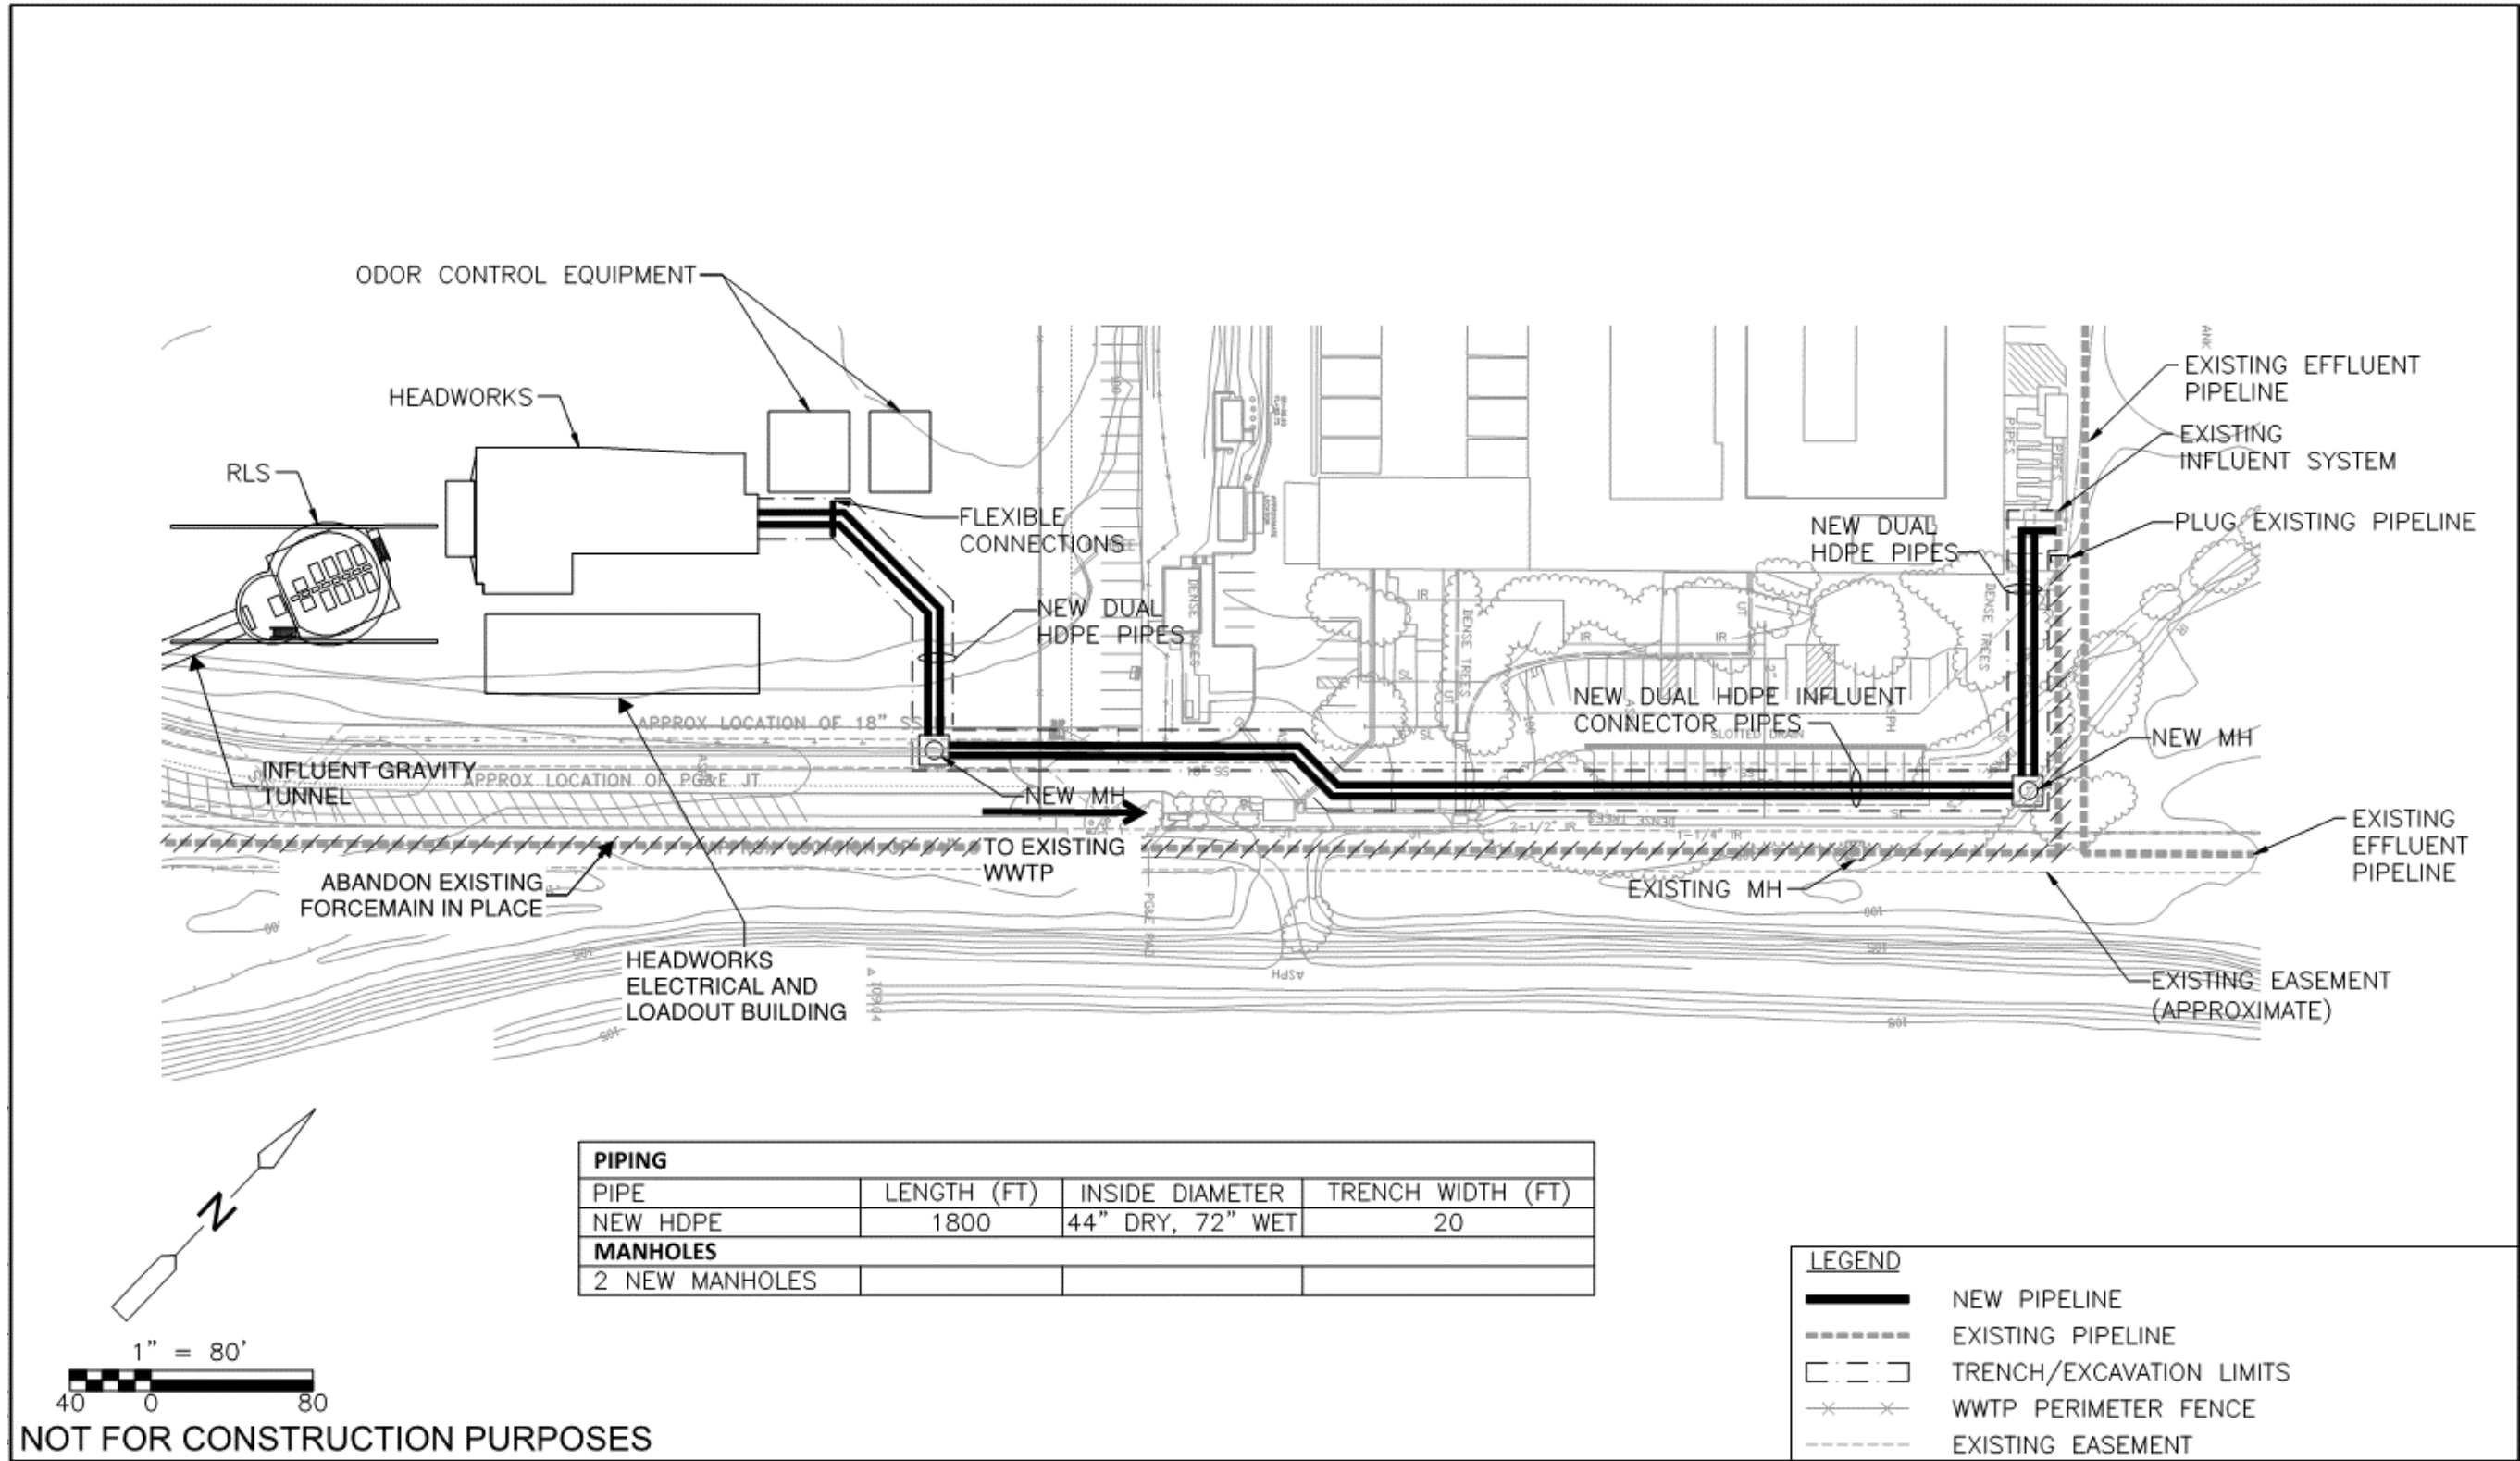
CONCEPTUAL FACILITY LAYOUT
